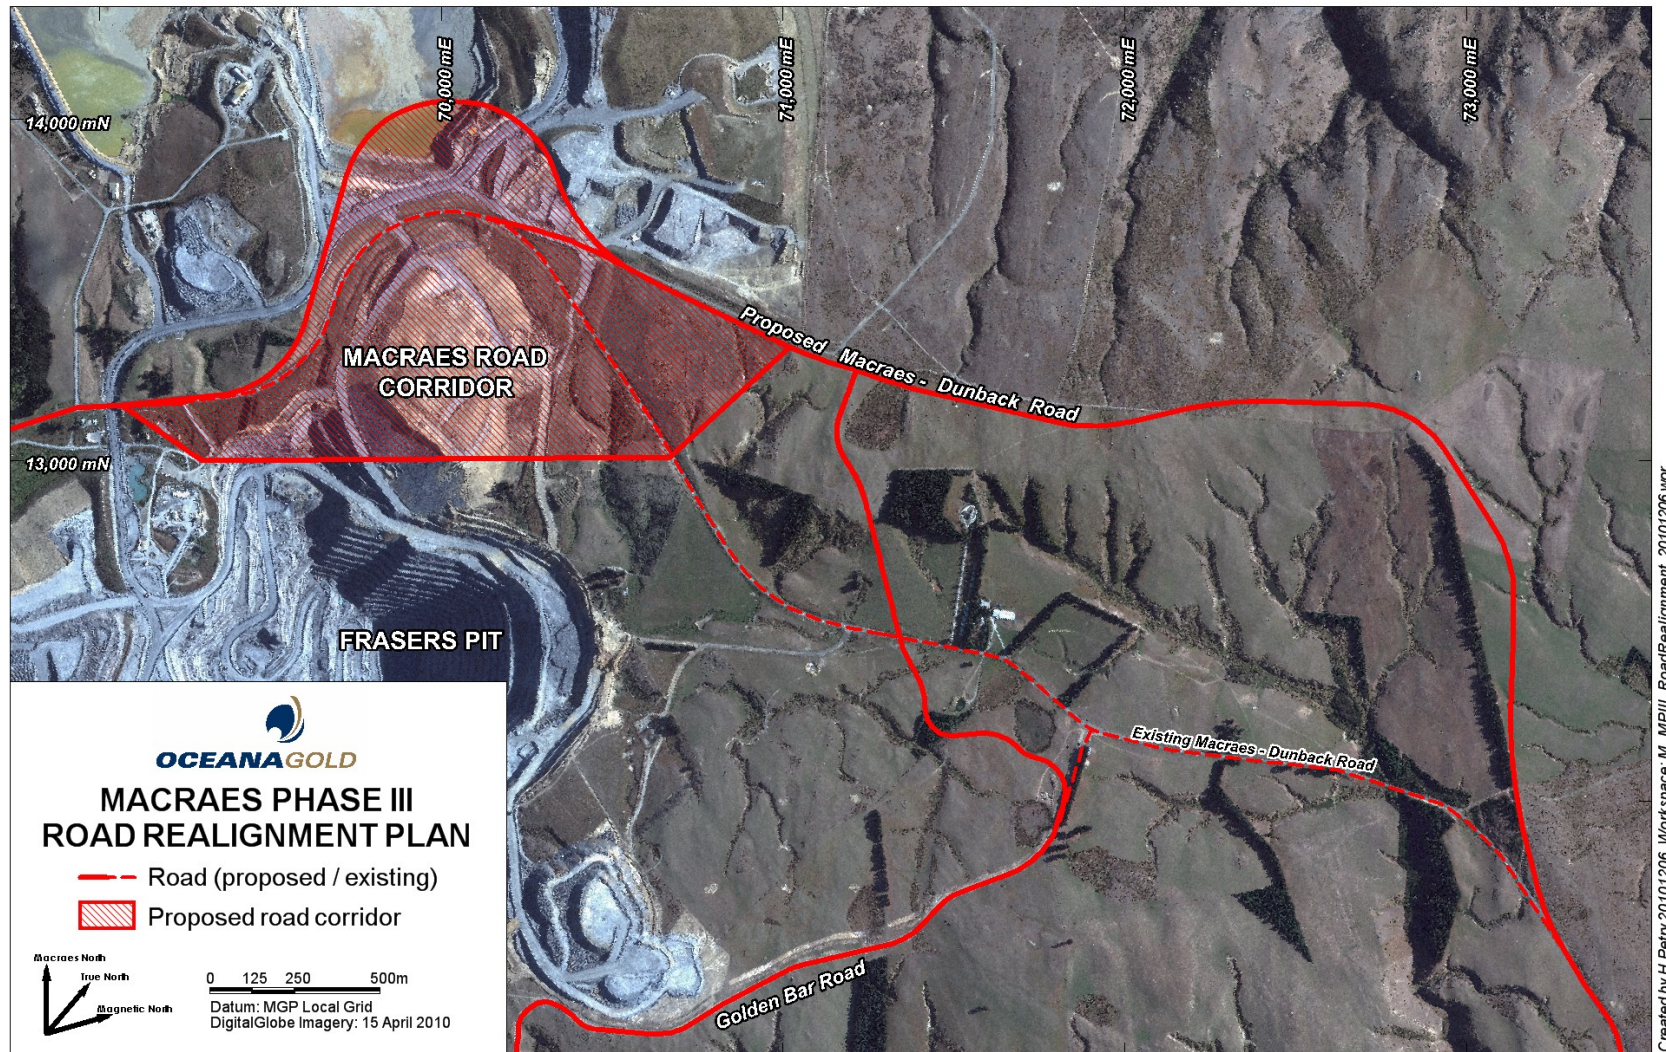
Map showing location of proposed second and third road realignment stages of the Macraes-Dunback Road and proposed first and second road realignment stages of Golden Bar Road.
